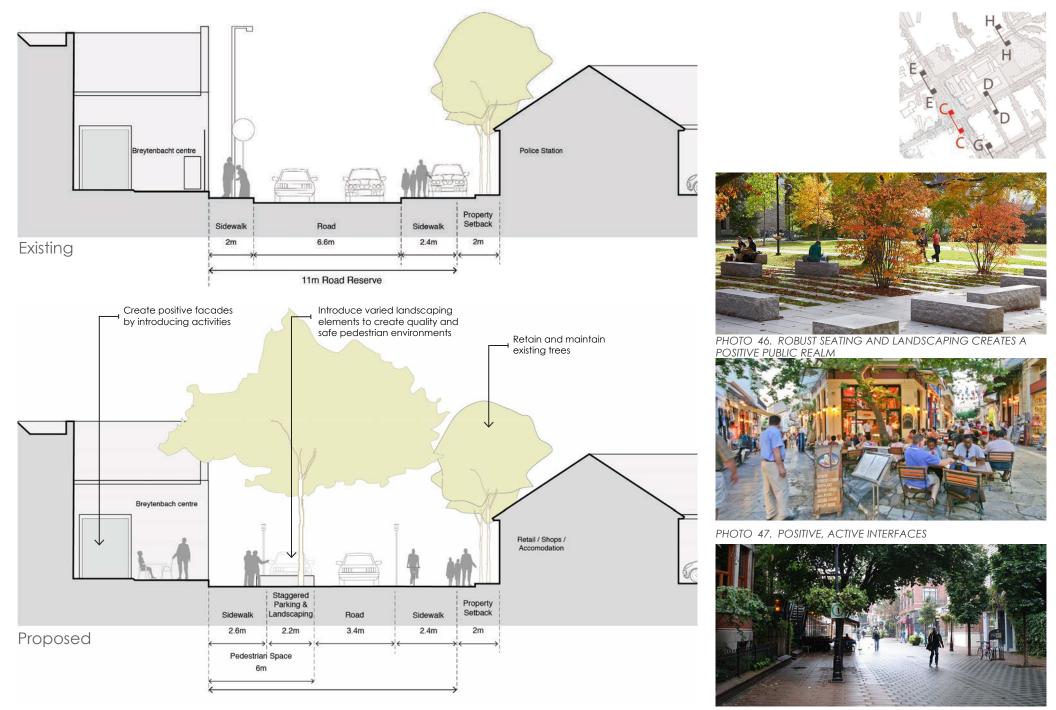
SCHOOL TO PARK | BREYTENBACH CENTRE SECTION CC
